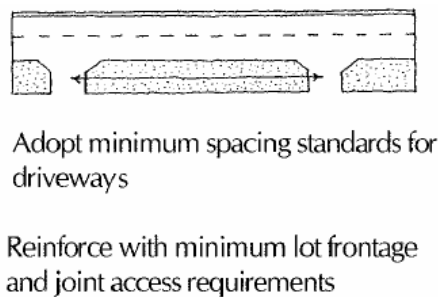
Driveway spacing standards (CUTR, 1998)
